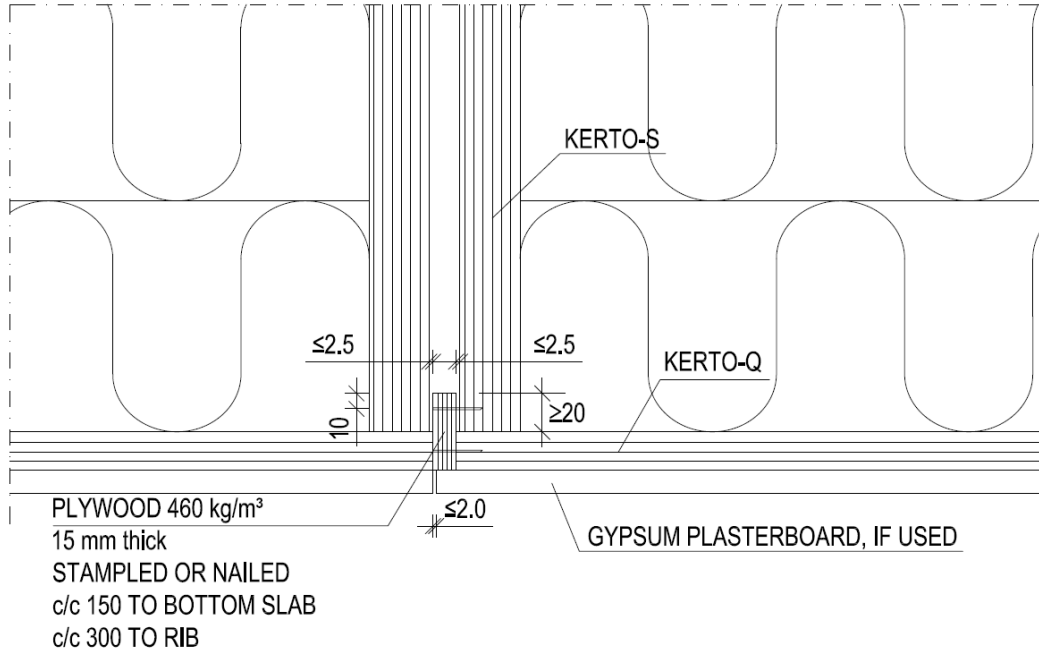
The joint between the elements sealed with a wooden batten or plywood at the bottom of the rib.
